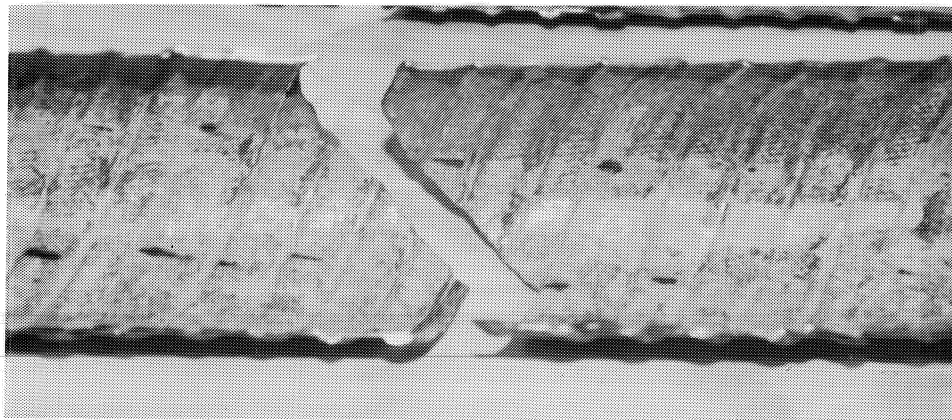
Fractured Metal Duct of Specimen P-M-1-25
